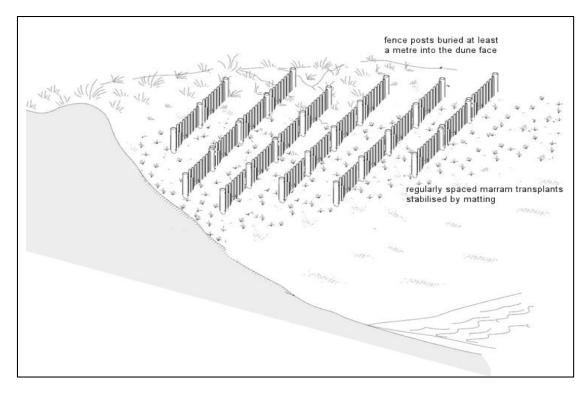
Typical section of a re-profiled dune face stabilised with sand trap fencing and the planting of marram grass
